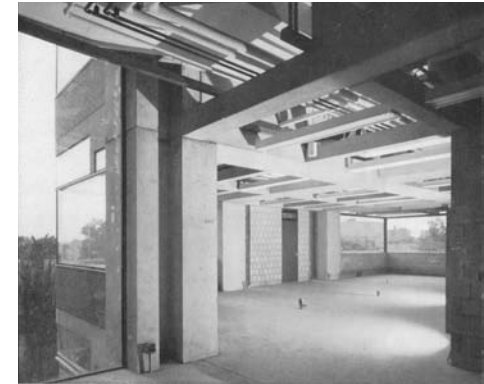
Richards Medical Building -photo showing services within ceiling trusses and open configuration.
